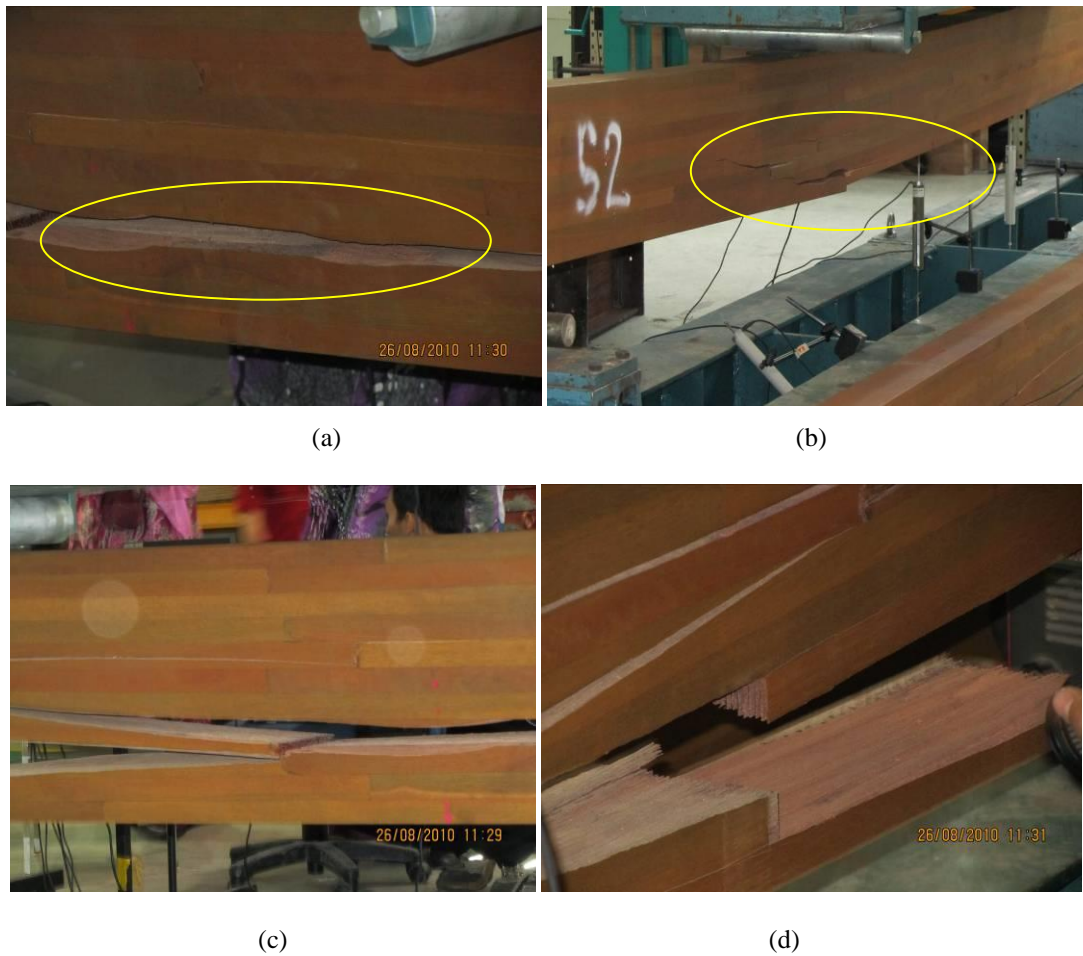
Failure of Keruing beams; (a) failed in timber, (b) failure started at tension zone, (c) the cracks proceed to weaker zone, finger joint area and (c) showing failed at timber surface not at the gluline.
